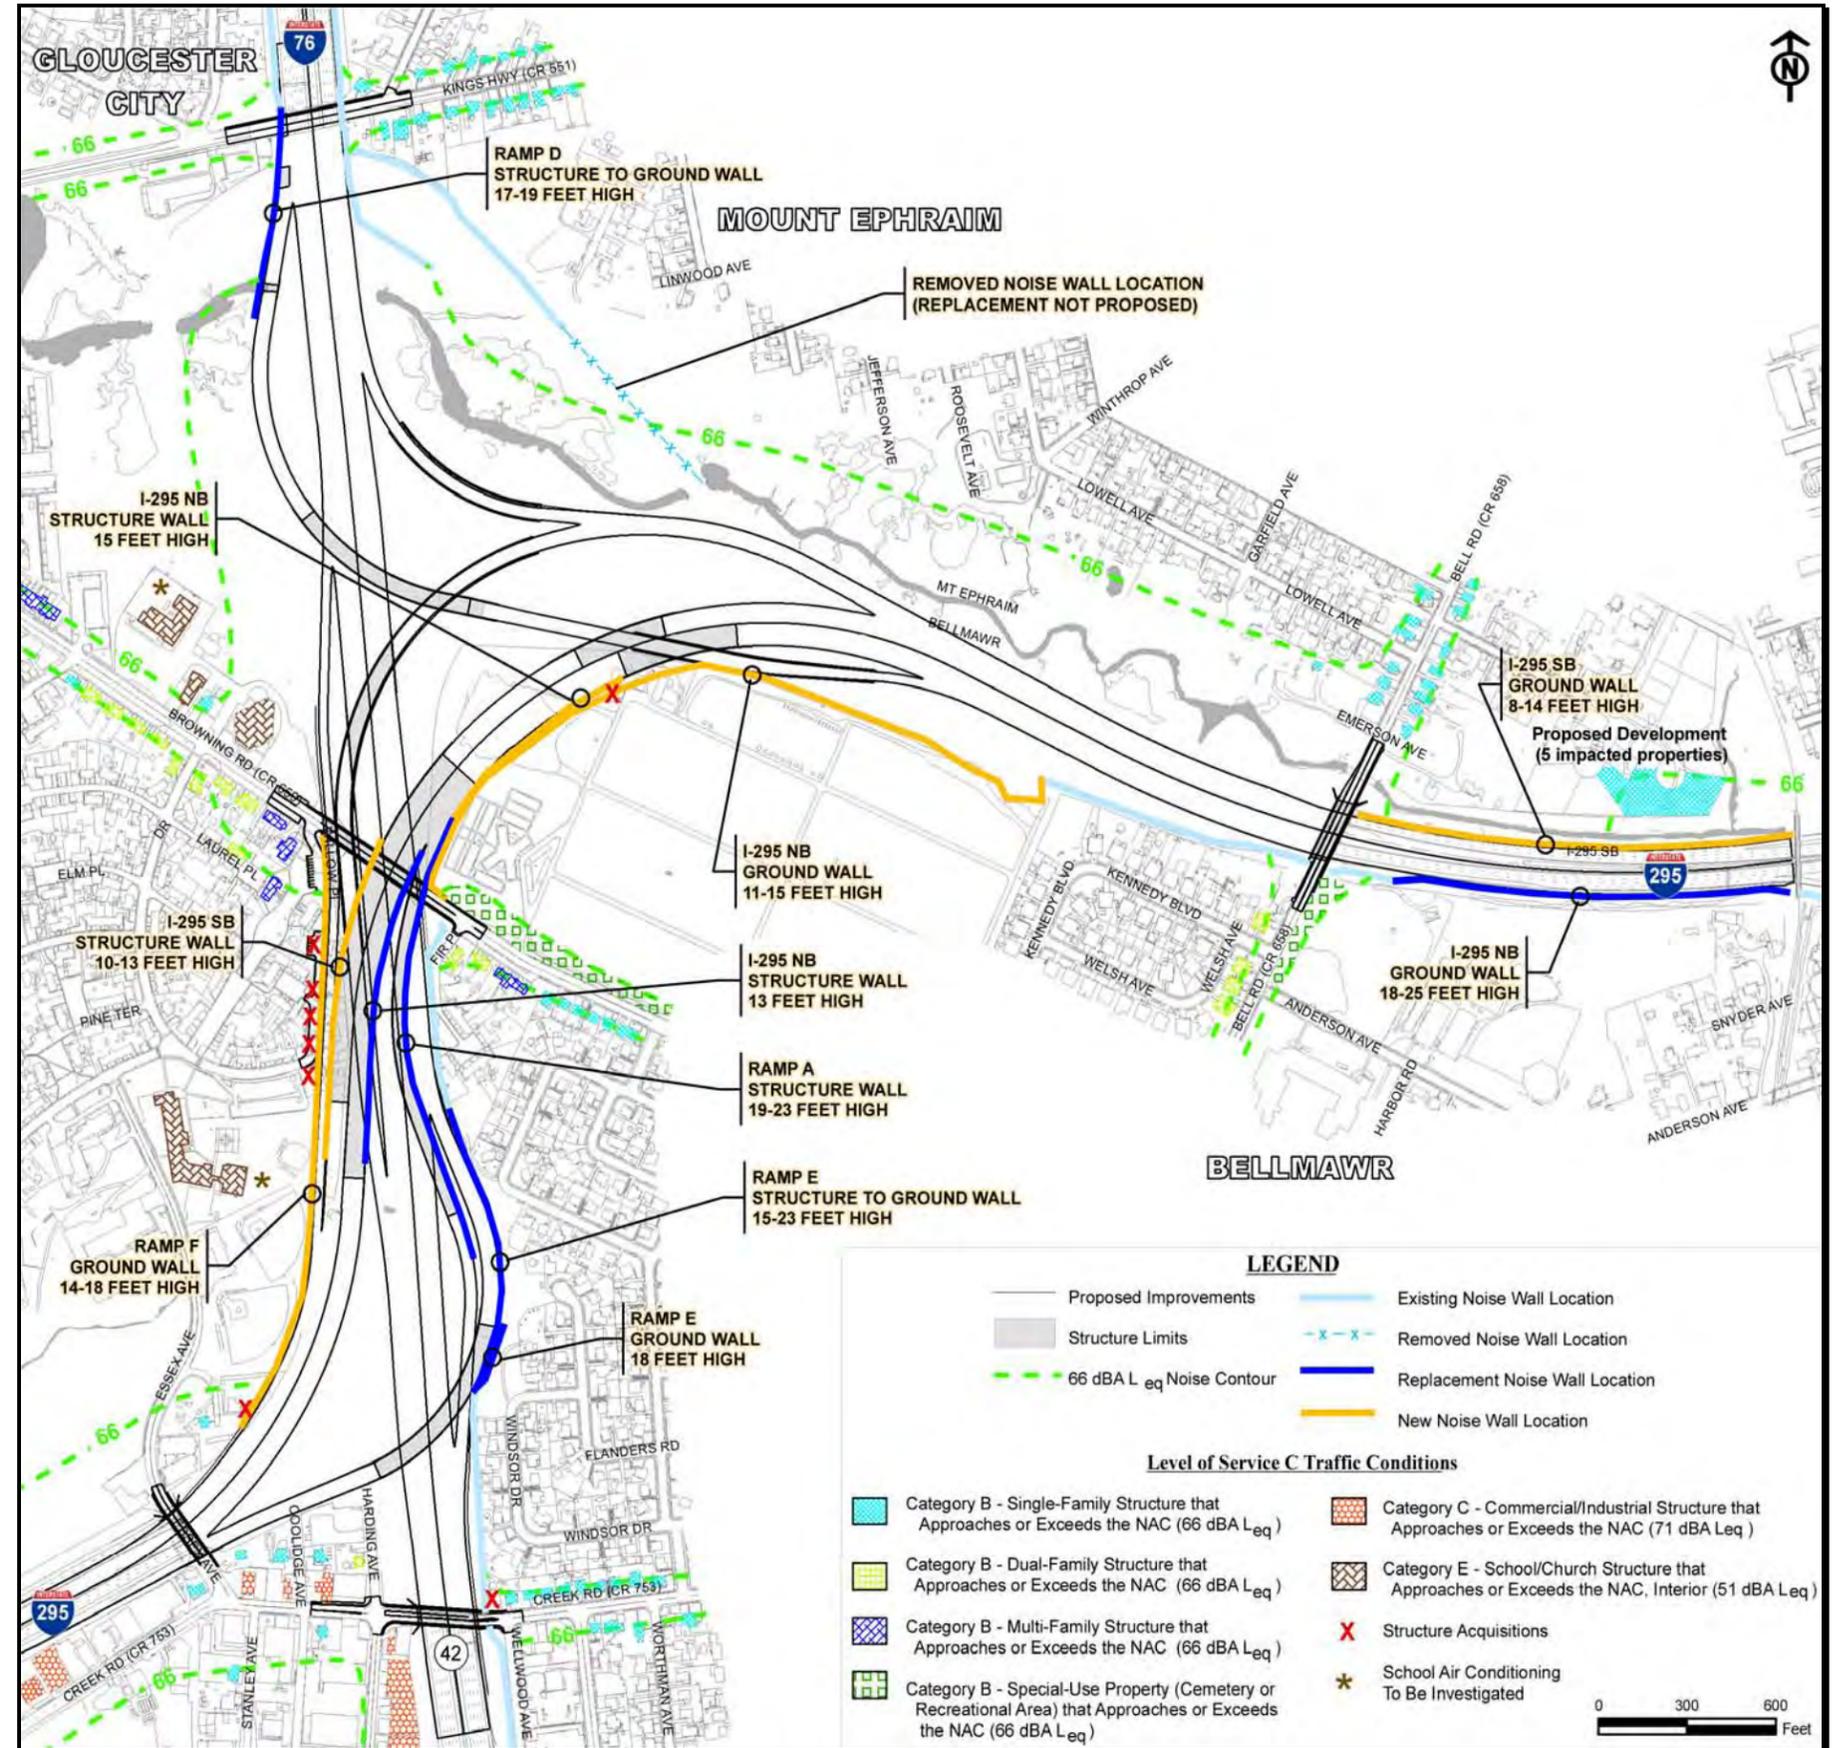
2030 Alternative D Proposed Noise Walls
